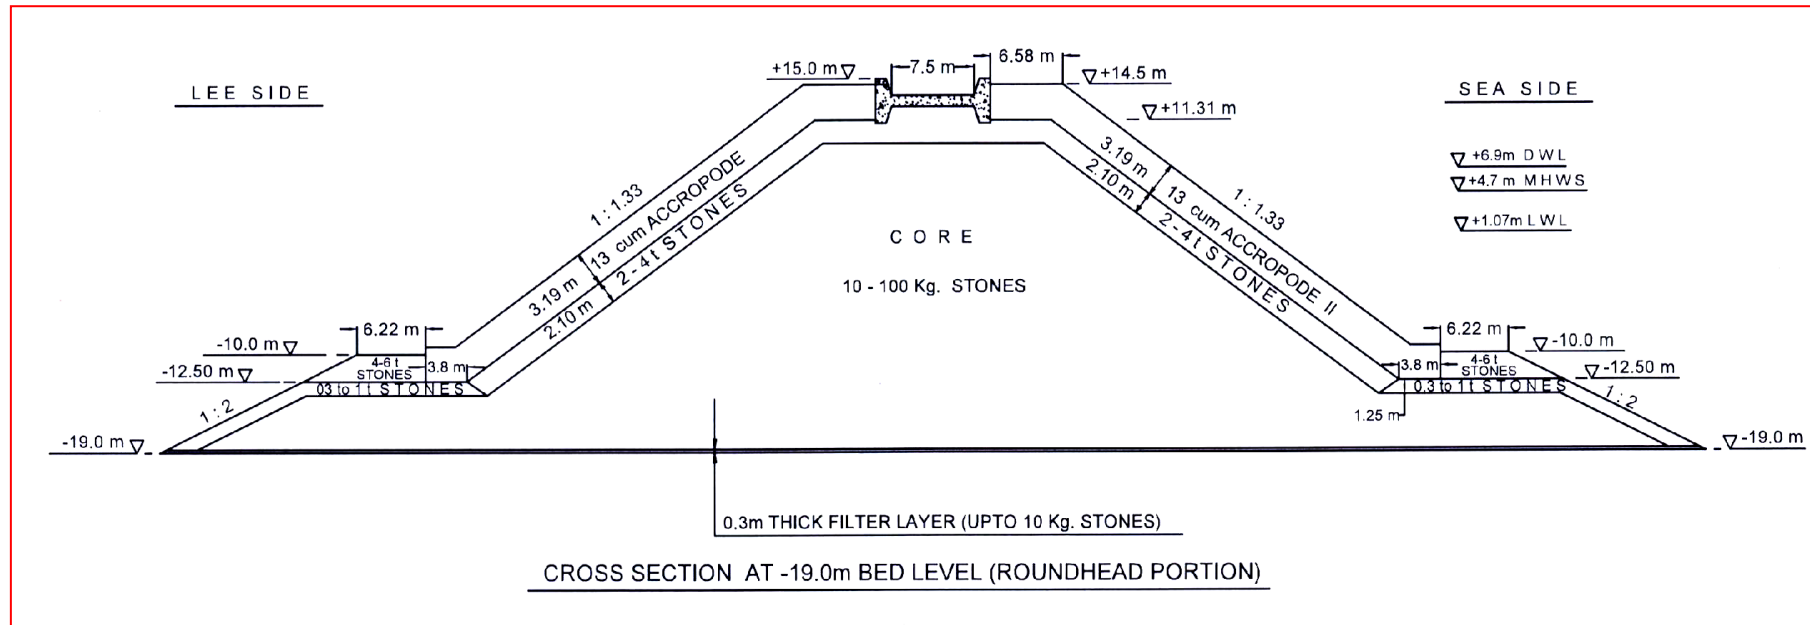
Roundhead cross section (-19.0m) of breakwater for the development of Port at Vadhavan, Maharashtra
